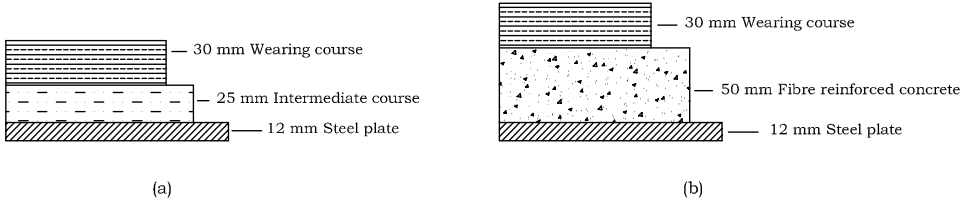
(a) Detail showing typical surfacing for an orthotropic steel bridge deck (b) Proposed system using a steel plate and a layer of cement-based material acting as a composite and a 30 mm wearing course on top.
